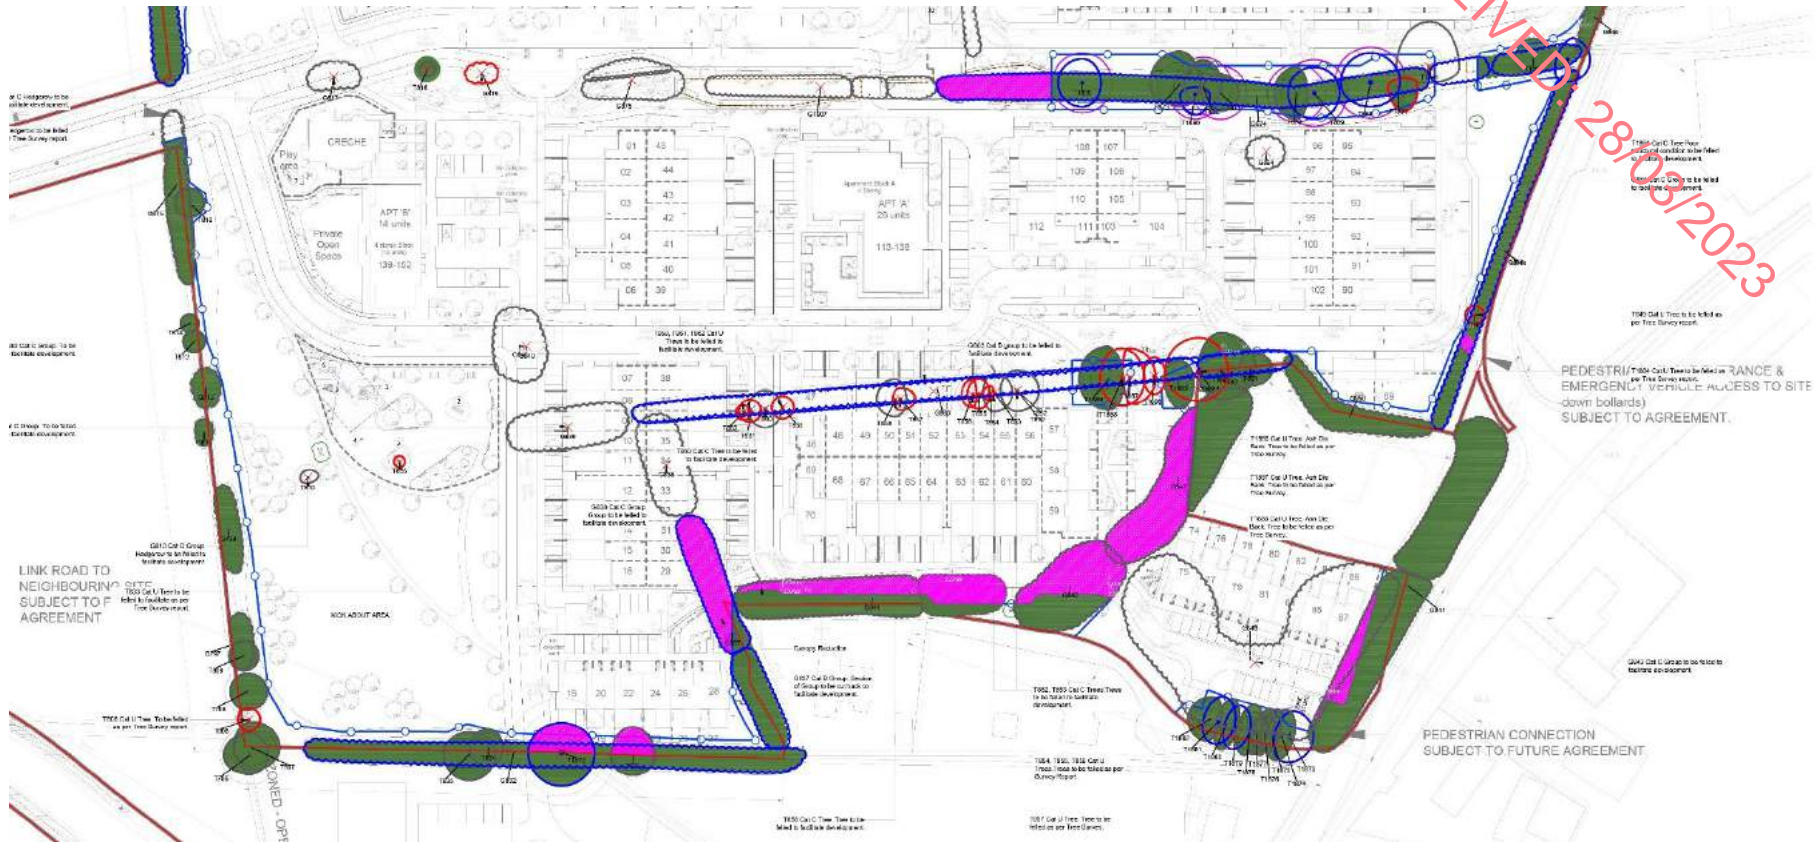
Development Impact Plan 2/2. Source: Park Hood Chartered Landscape Architect
